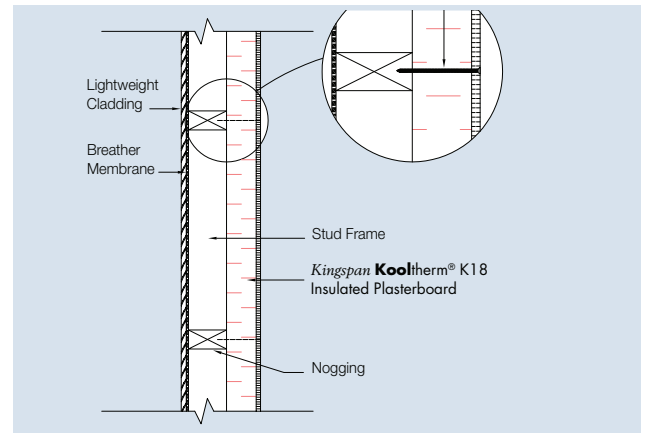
Side elevation - Lightweight clad stud wall with *Kingspan Kooltherm*[®] K18 Insulated Plasterboard
